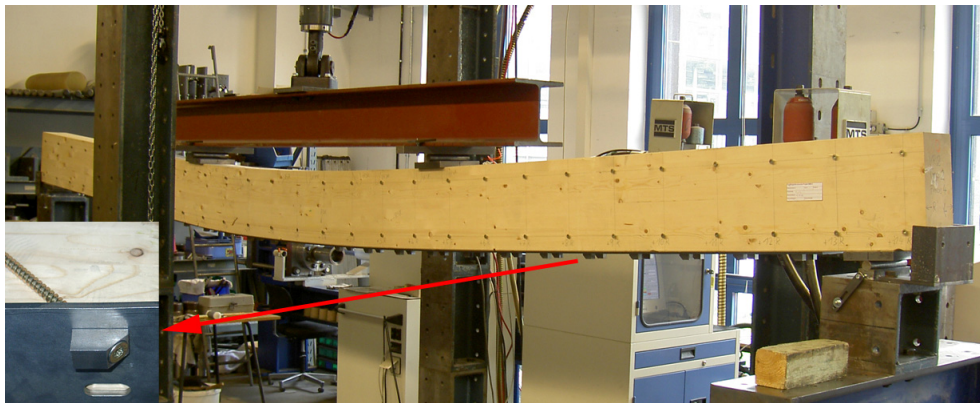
Glulam beam with external lamella and internal screw reinforcement in bending test, down left detail of the anchoring chock to fit the screws to the lamella
